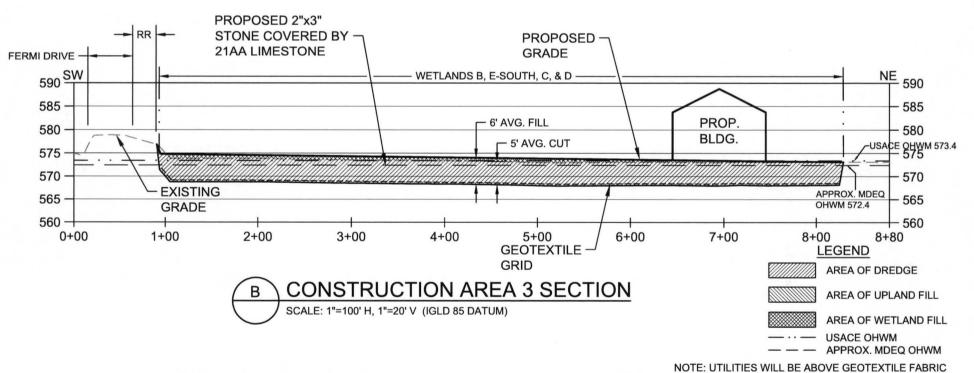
C CONSTRUCTION AREA 3 SECTION DETAILS
